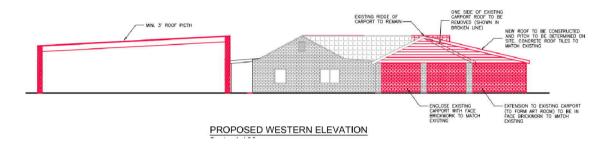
EXISTING DWELLING AND PROPOSED CHANGES INDICATED IN RED
